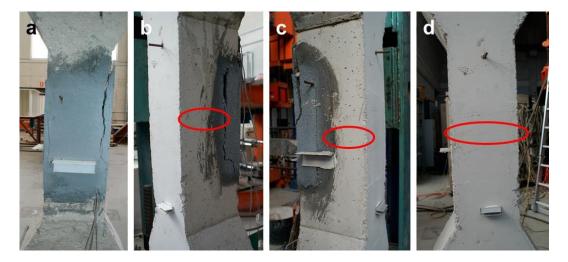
Column failure: Specimen P4W (repaired column with R4-mortar and no BA): a) Side 1; b) Side 3; c) Side 2;
